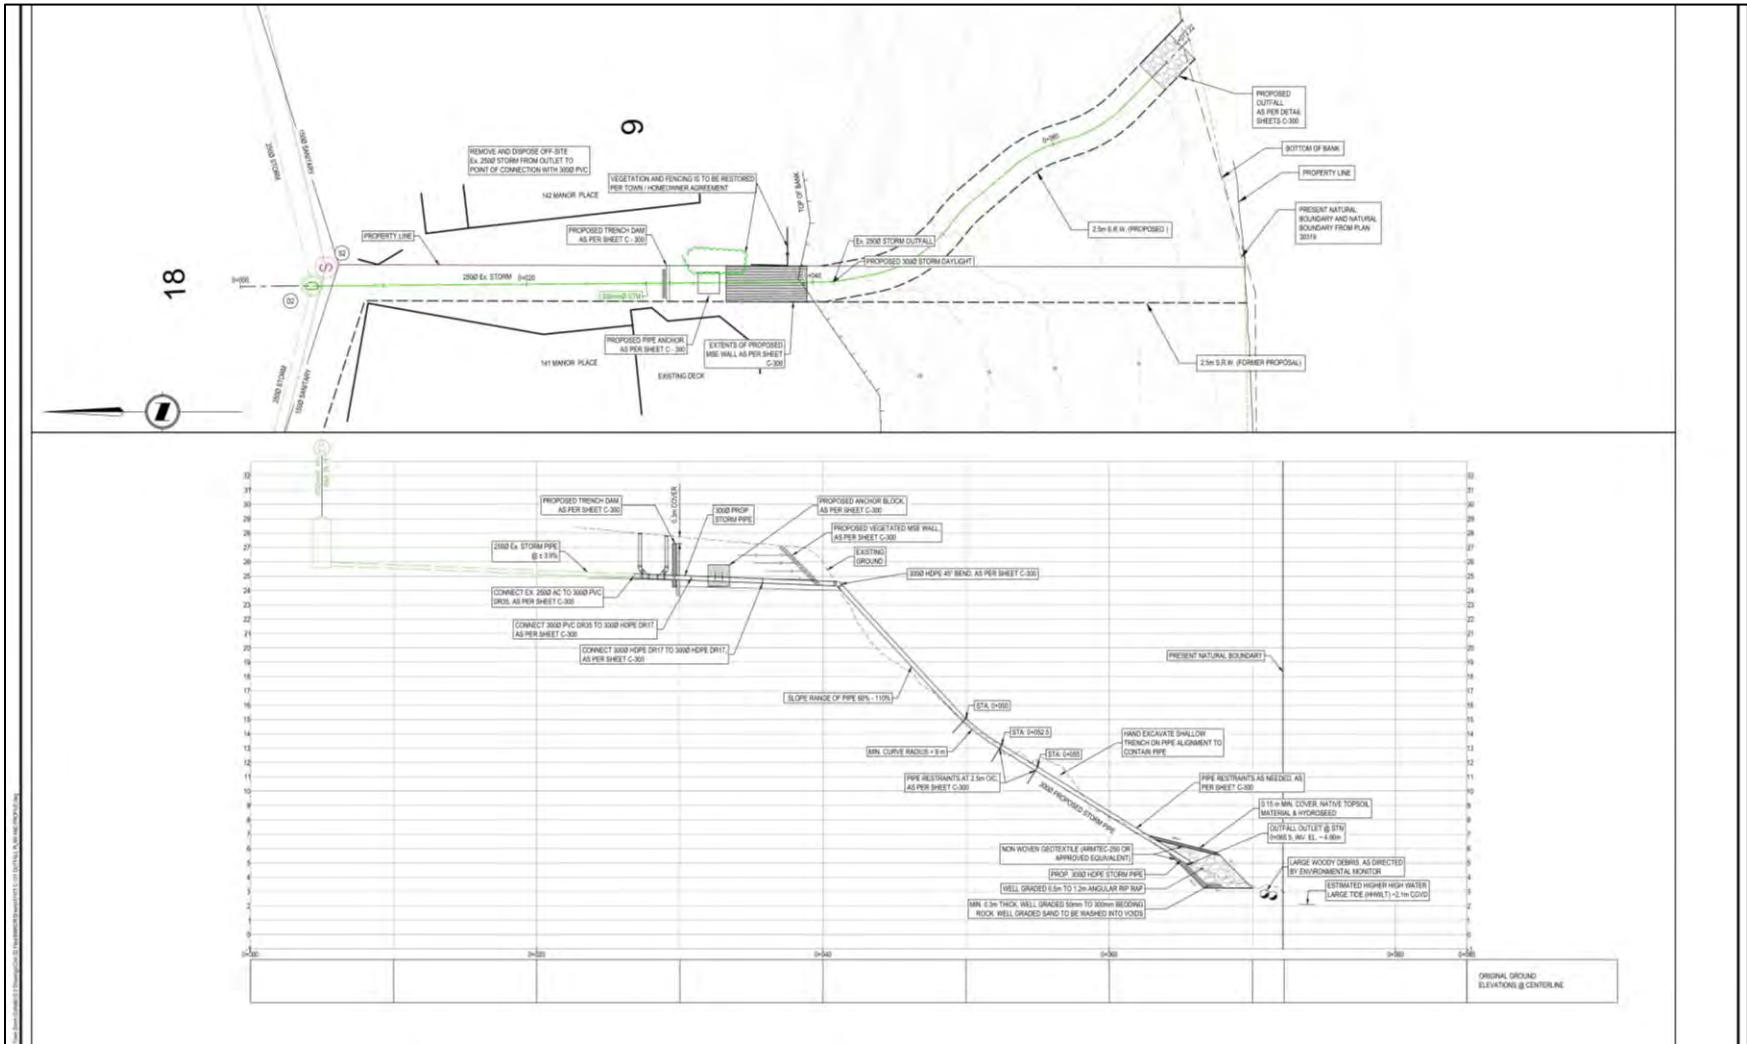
Typical design of stormwater pipe running down a steep slope and discharging through a rock exfiltration gallery.
